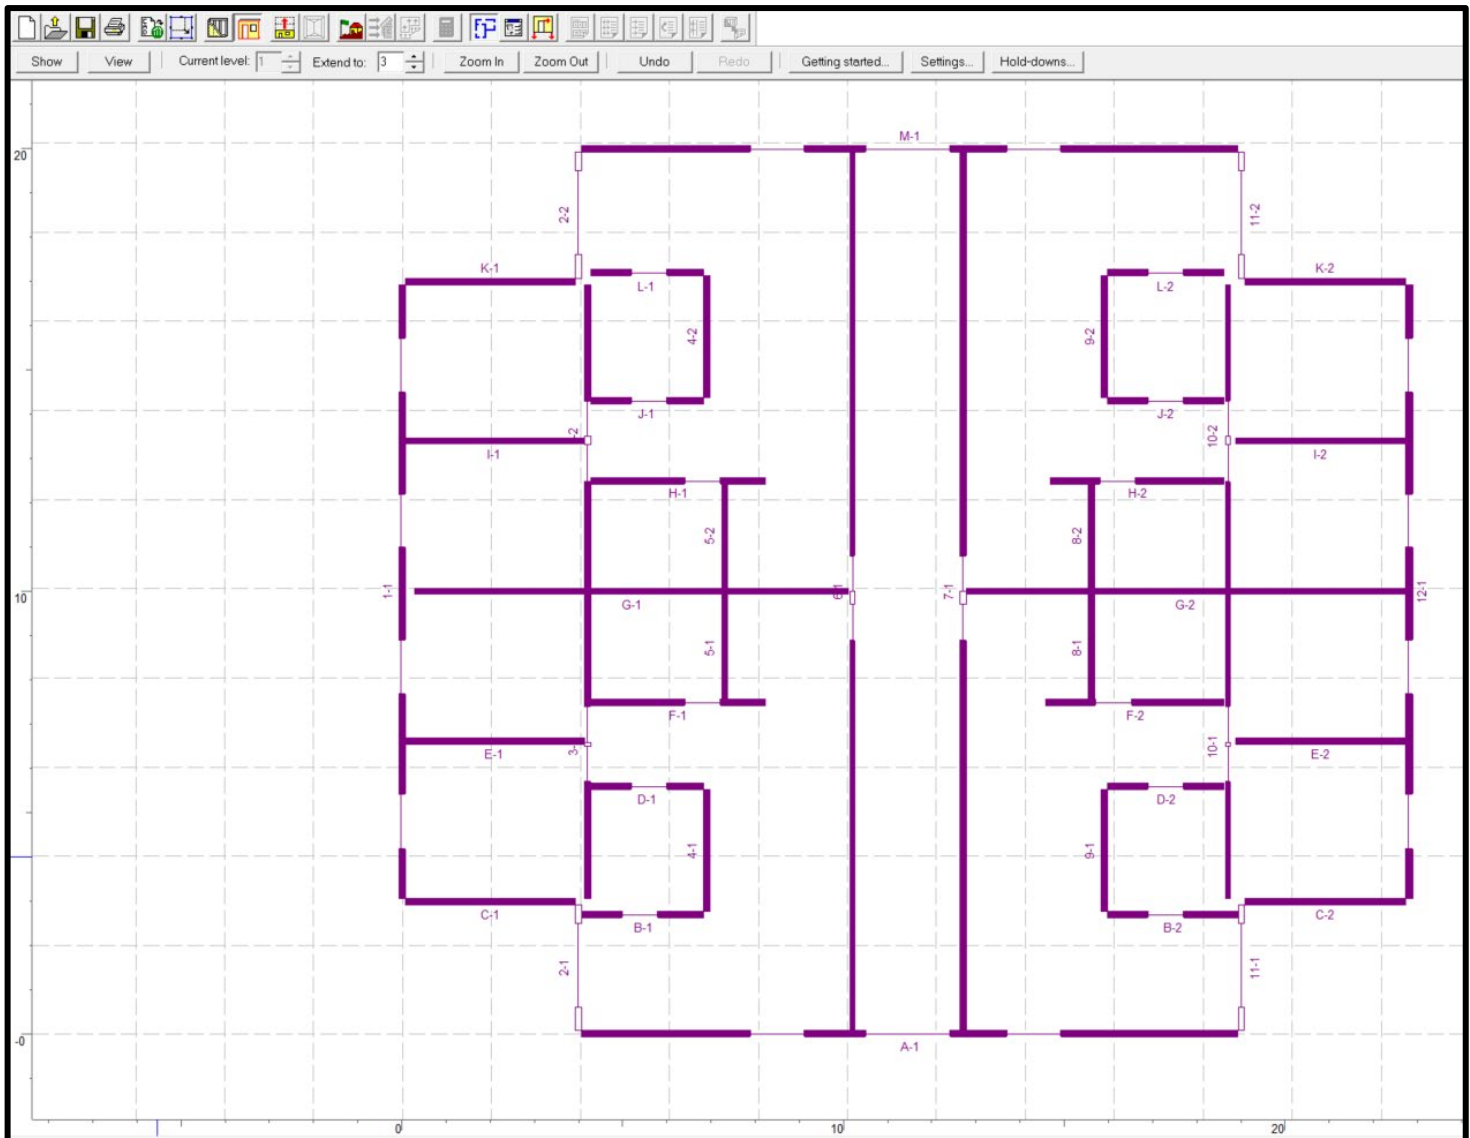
Shearwalls Tutorial 6 – Level 1 Door and Window Openings (Without CAD Drawing)
